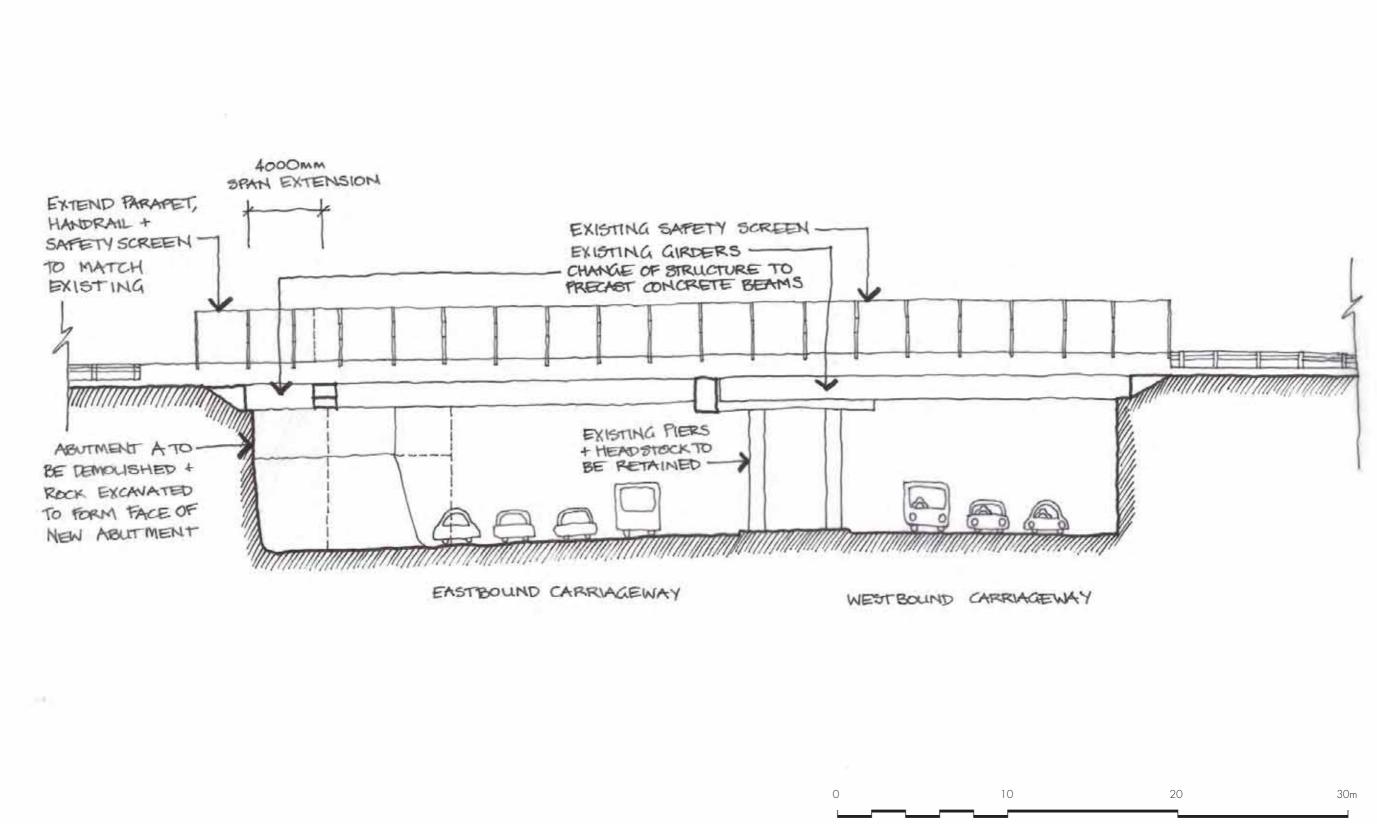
Bridge 2.2 Barclay Road Overbridge - Elevation
